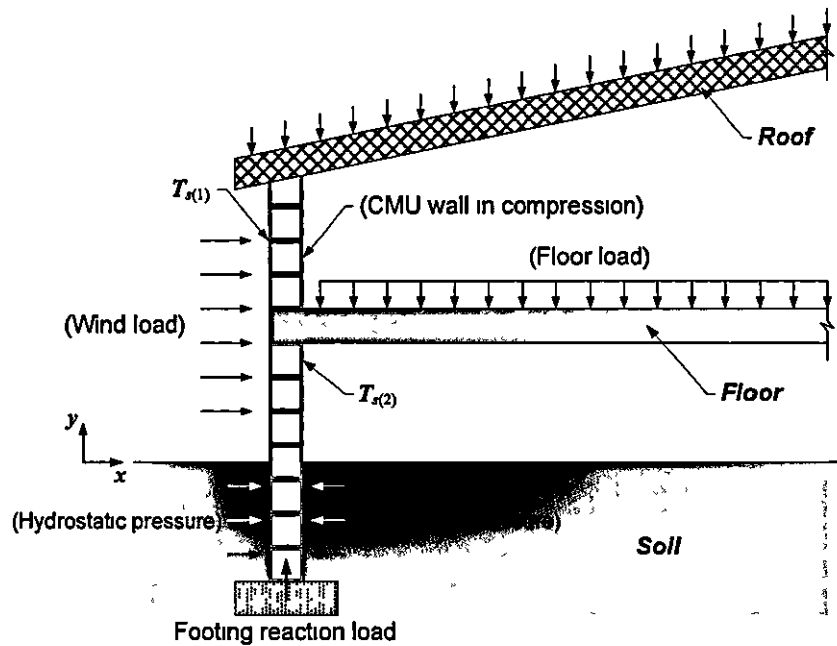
Typical loading condition of a load bearing CMU wall (cross-sectional view)
